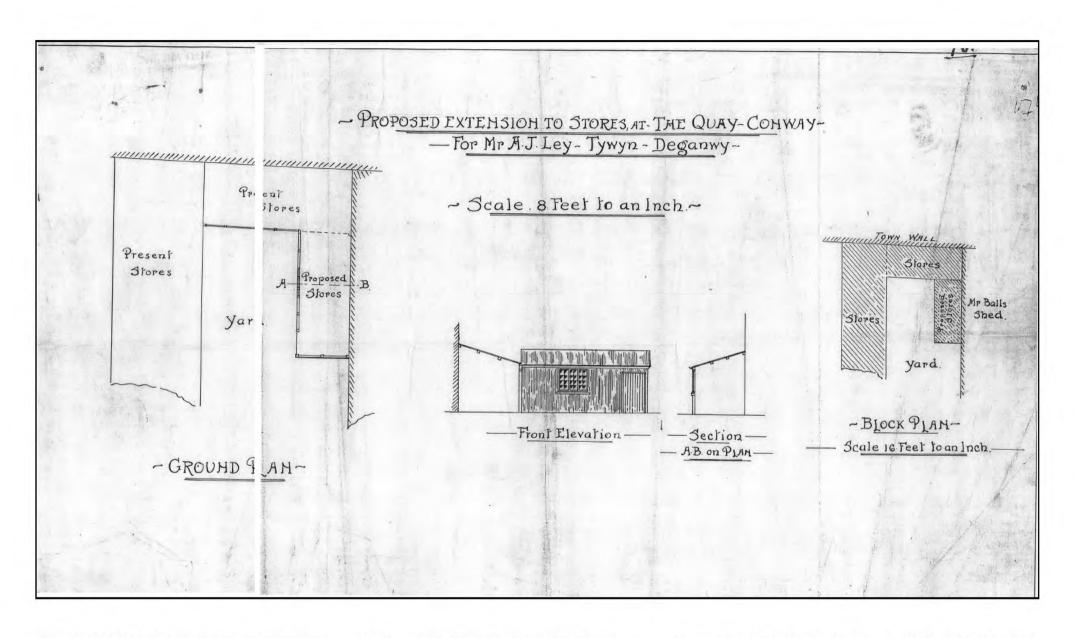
Yard 02 (PRN 30454): Building 11 (PRN 30456): reproduction of CMP 23/2/190 (1906). Building 11 is located against the town wall in the plan for a new shed in Yard 2 (Building 11 is described as "Stores" in the Block Plan). Building 11 was part of A.J. Ley's bottling plant and later became part of Crossfield's timber yard. (Source: Conwy Archive Services)
